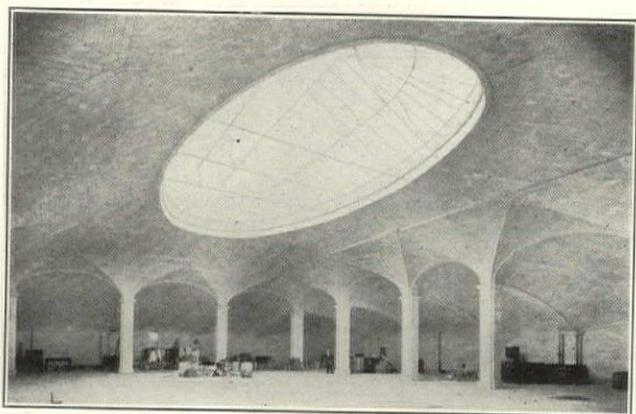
INTERIOR OF THE EXHIBITION ROOM, COVERING THE ENTIRE TOP STORY OF THE TIFFANY BUILDING, NEW YORK CITY. GUASTAVINO SYSTEM. EXECUTED IN ENAMEL TILES.
